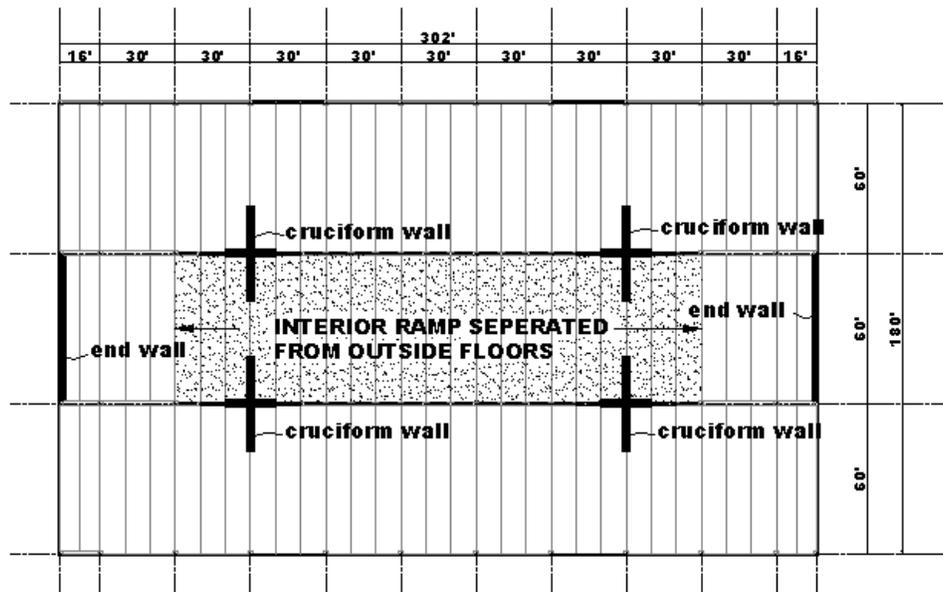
Illustration of diaphragm layout with multiple walls
